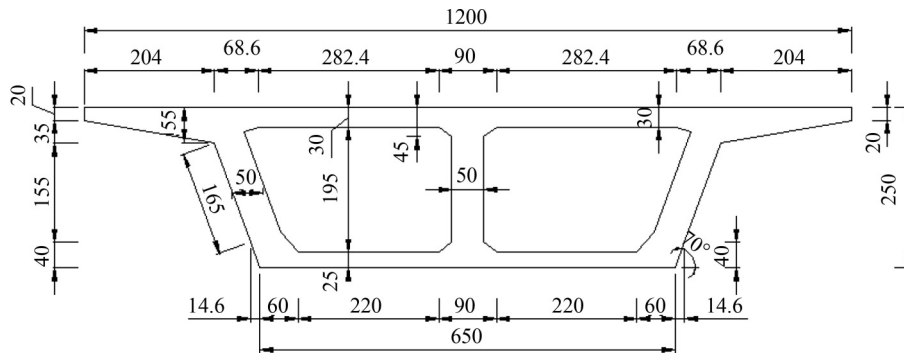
Sectional dimensions of the box girder with corrugated steel webs (cm).
